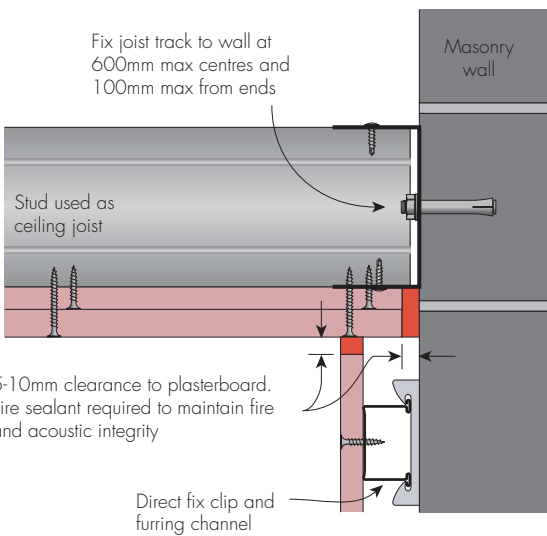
Non-Trafficable Ceiling to Masonry Wall
